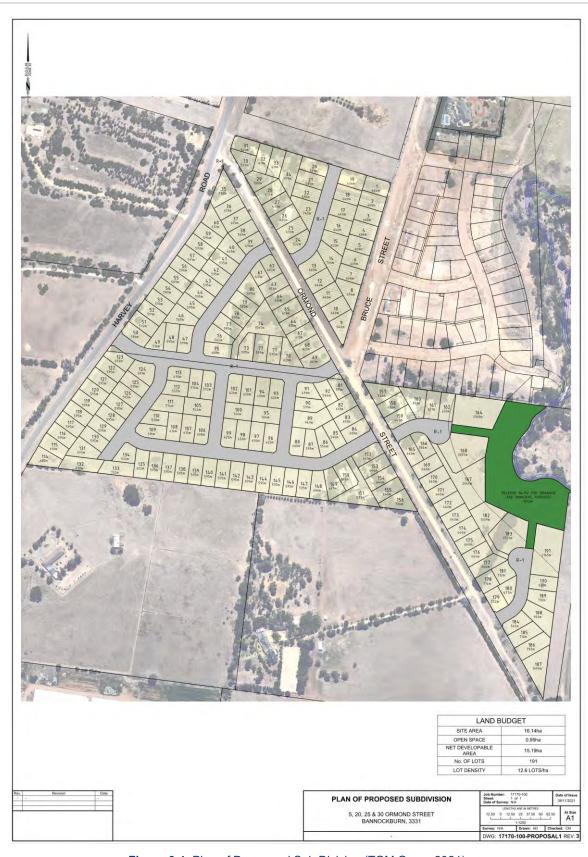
Plan of Prosposed Sub Division (TGM Group 2021)
